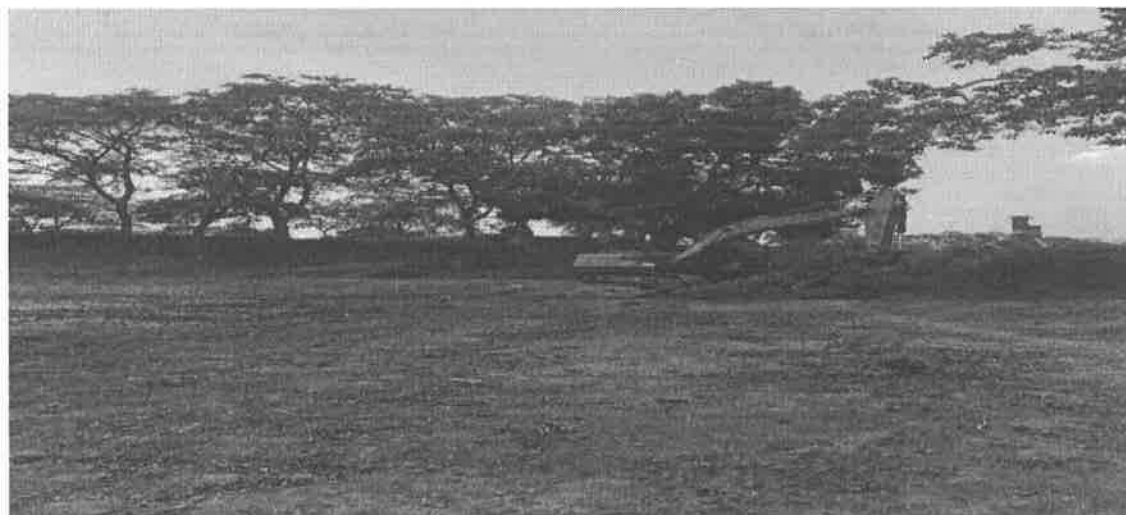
Deepening & cleaning of Darri Pond, Rampur and Lavlin Pond at Badadarha.
